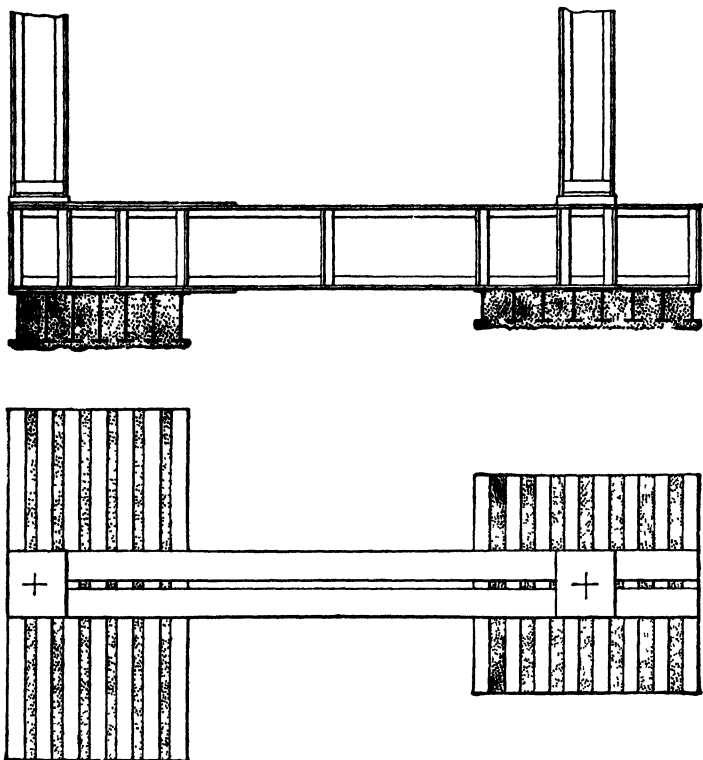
Cantilever Foundation. Grillage Fulcrum
